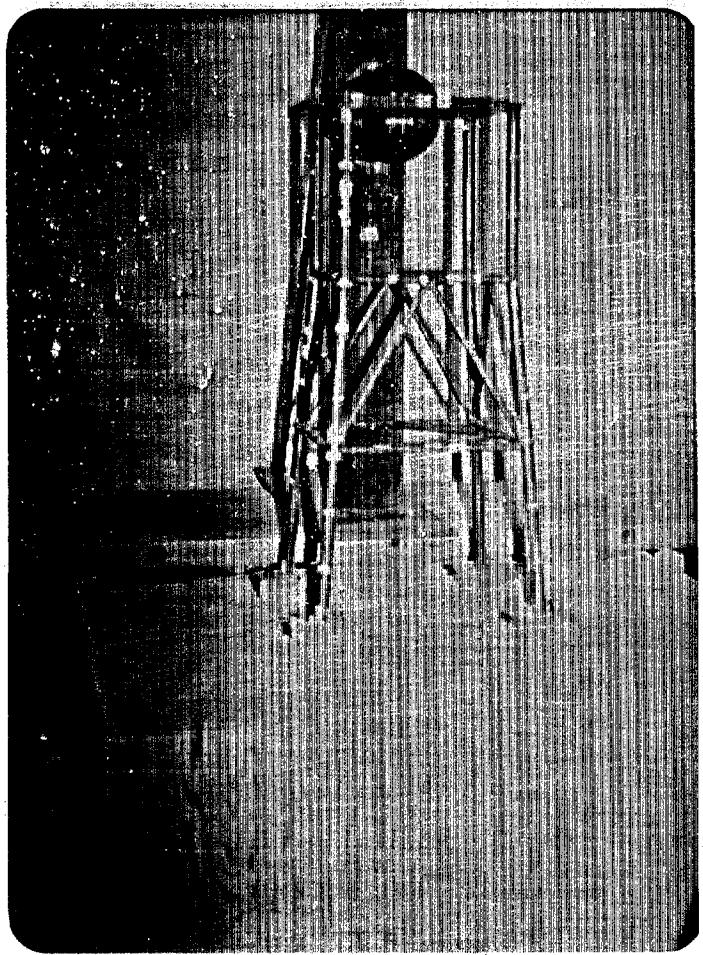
PILE FOUNDATION TEST, 1/40 SCALE MODEL, SOIL FOUNDATION CONDITION
